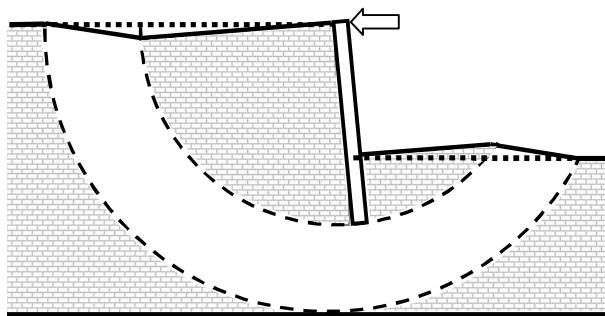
Observed patterns of incremental wall deformation depending on wall stiffness and propping conditions during excavation (Lam et al, 2011)
